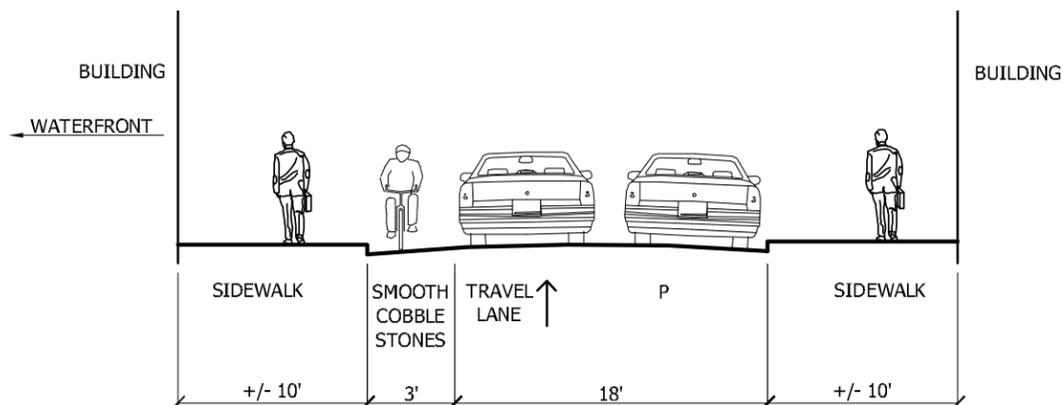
Possible configuration for Plymouth Street looking west from Jay Street
